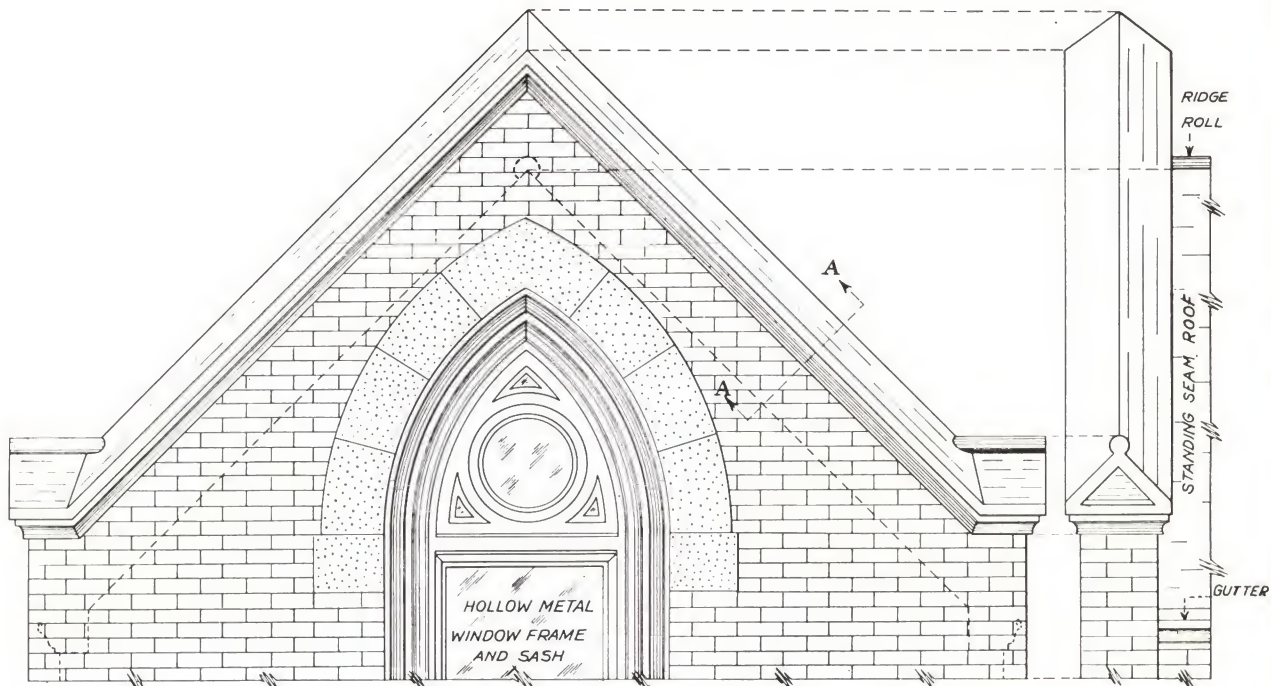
FRONT AND SIDE ELEVATIONS OF SHEET METAL COPING WITH HEAD BLOCKS, OVER BRICK GABLE WALL
